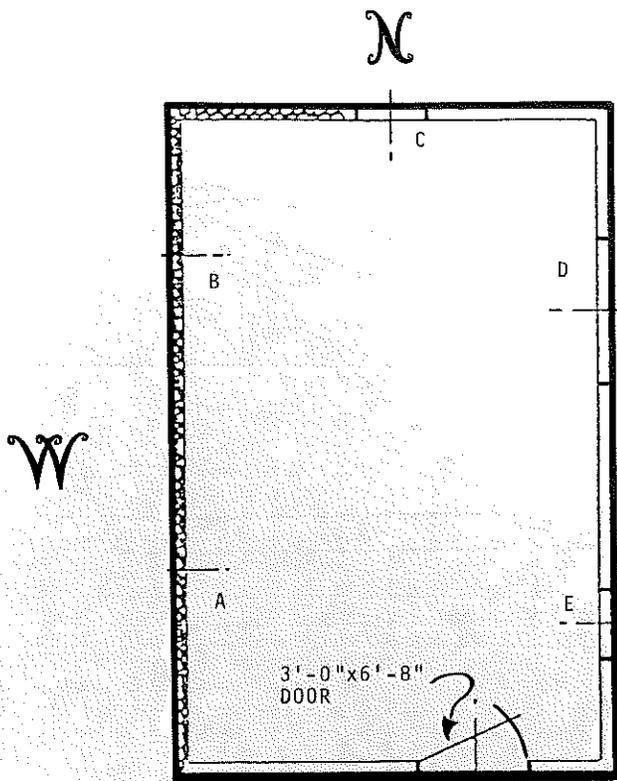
West wall and half of north wall of both units have no vapor barrier on warm side
